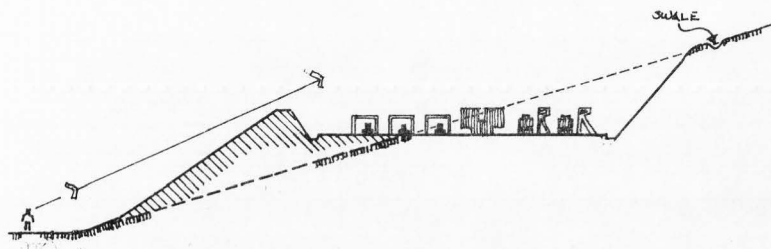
Multi auxiliary layout: Example (Mechanical draft cooling towers).
